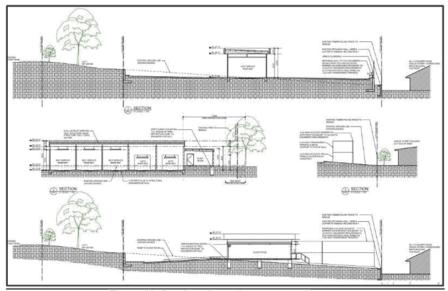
Section plans of new car wash (Source: MCHP Architects, Drawing No. 19-085 DA04 Rev B)
